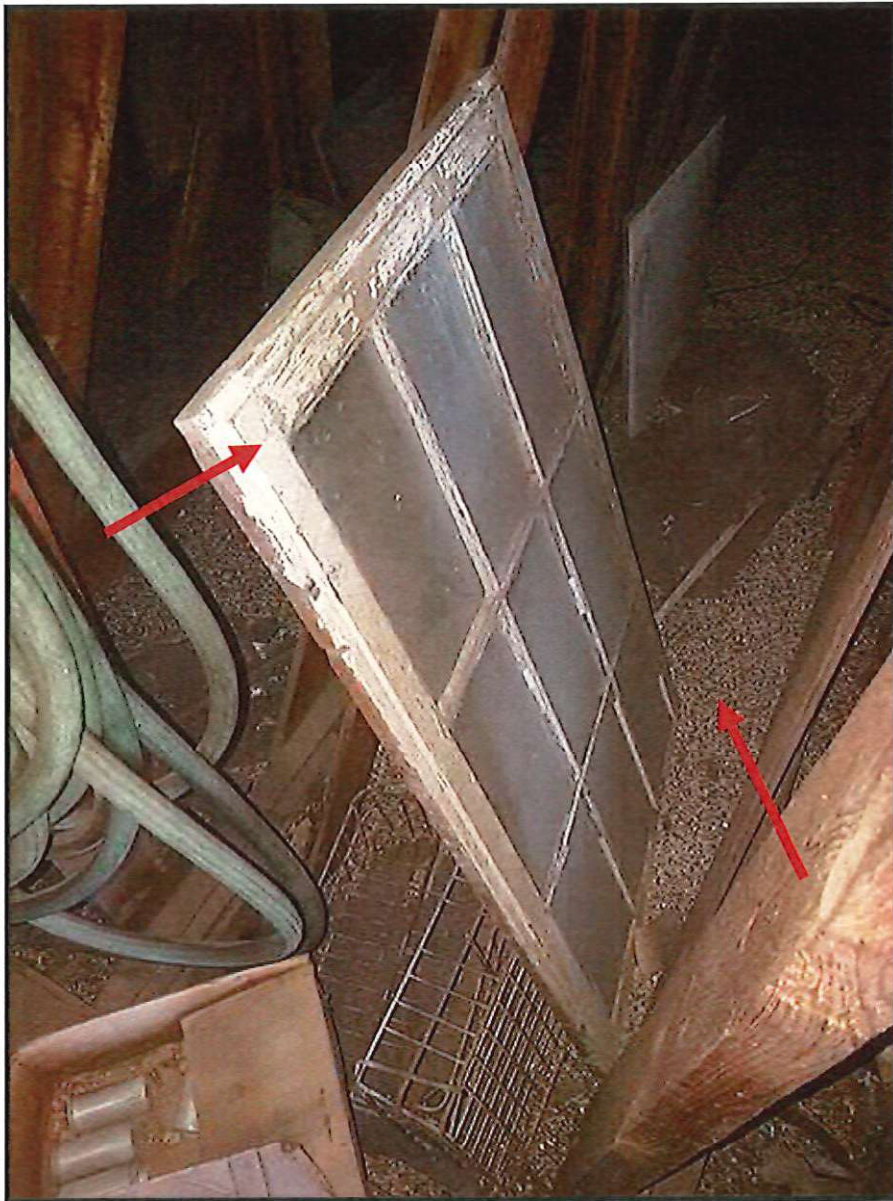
ASBESTOS CONTAMINATED VERMICULITE & WHITE LEAD-BASED PAINT ON STOCKPILED WINDOW IN ATTIC
